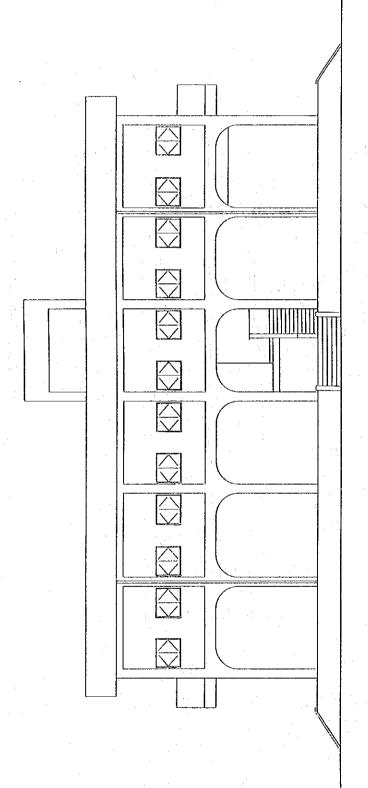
(4) ELEVATION (4-CLASSROOM TYPE)
